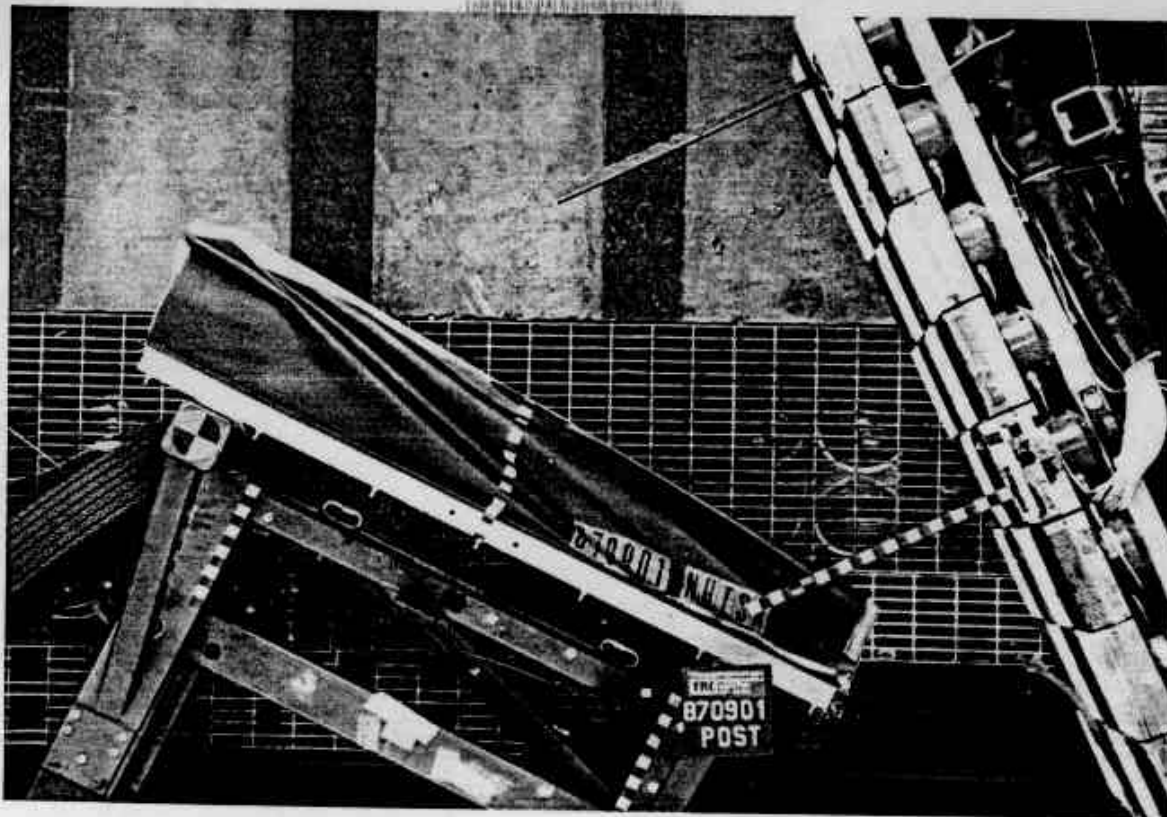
POST-TEST OVERHEAD - VIEW 2
